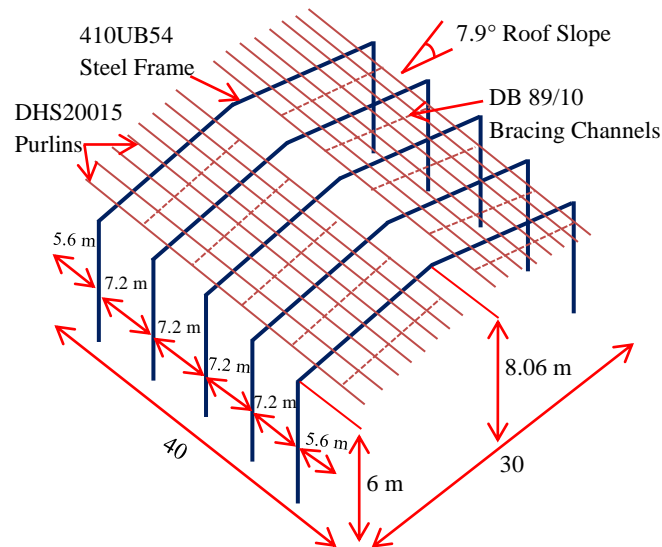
Case study steel portal-framed building (Bong, 2005).
